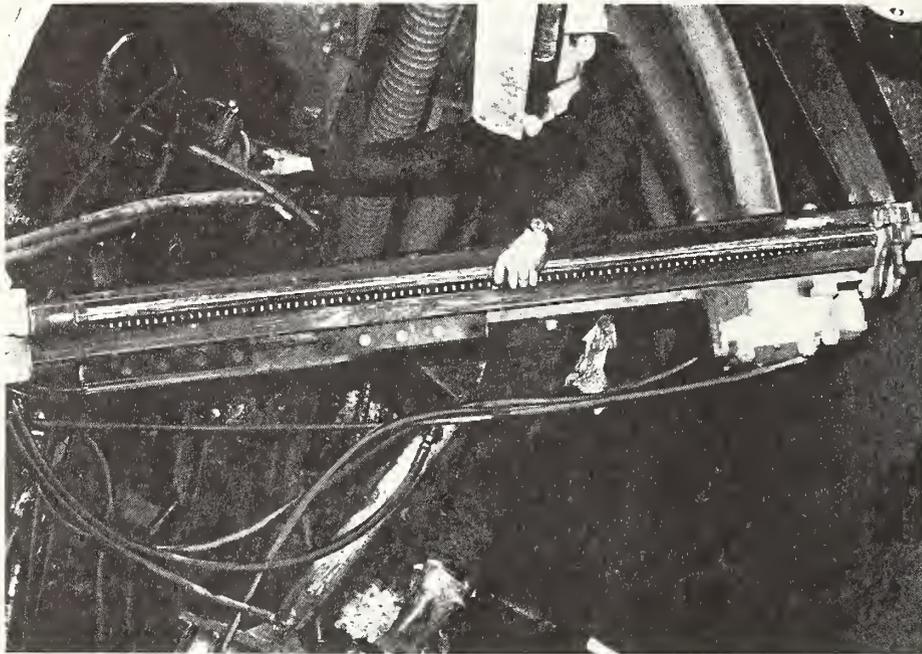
Drilling of Bolt Holes From The Tunneling Machine During Tunneling
